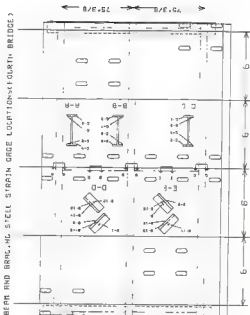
Beam and Bracing Steel Strain Gage Locations (Fourth Bridge)
